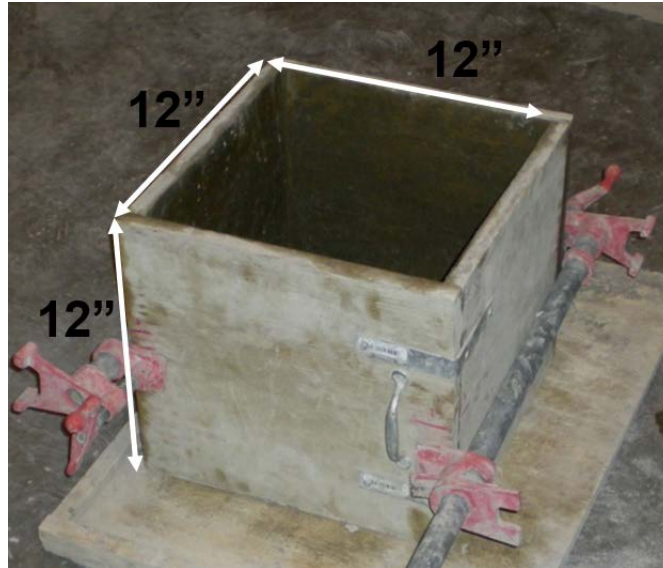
The Box Test Assembled with dimensions of 12 in (305 mm).
